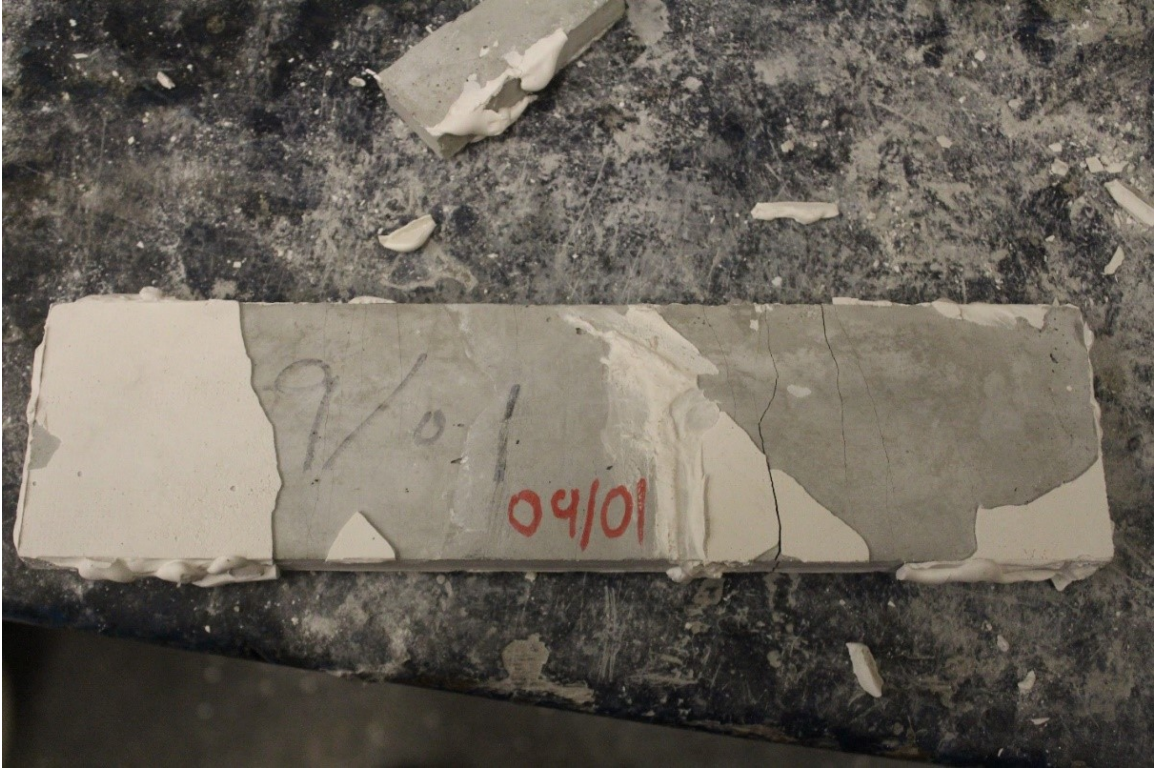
Tensile cracking on ECC07 coupon specimen
